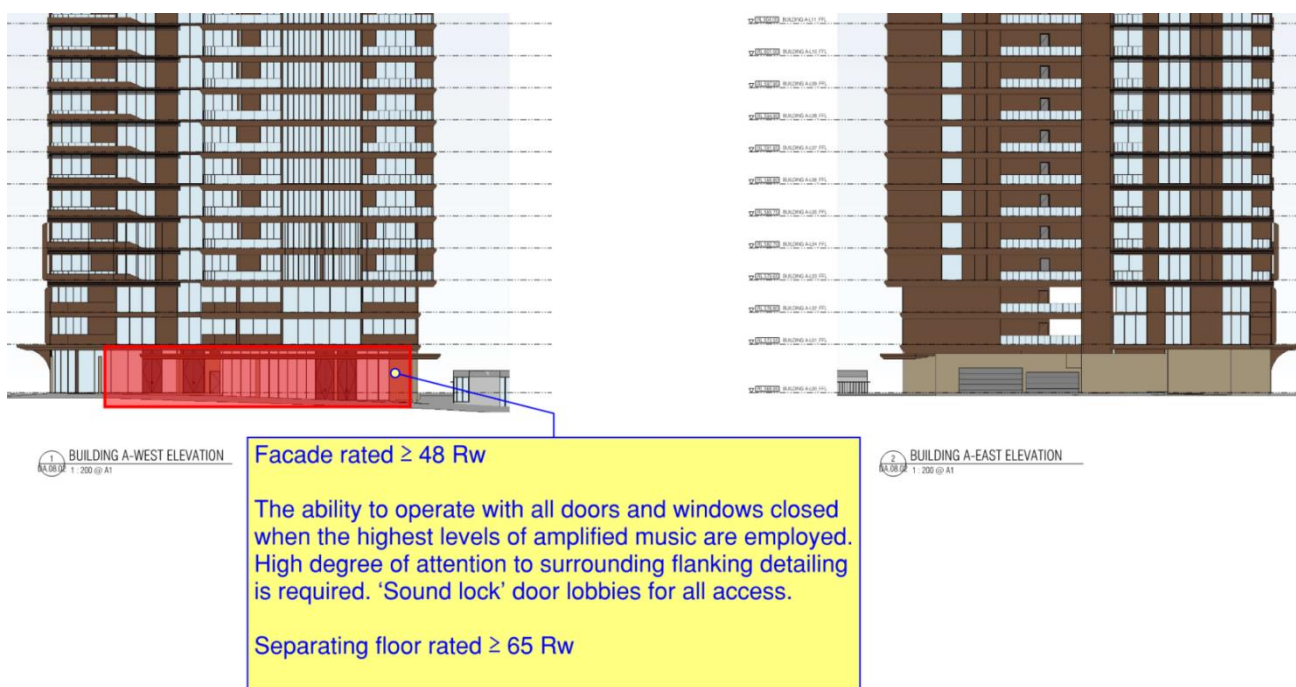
Building A façade construction requirements to mitigate amplified music (85 dBA $L_{10(5-15\text{min})}$) – west façade
